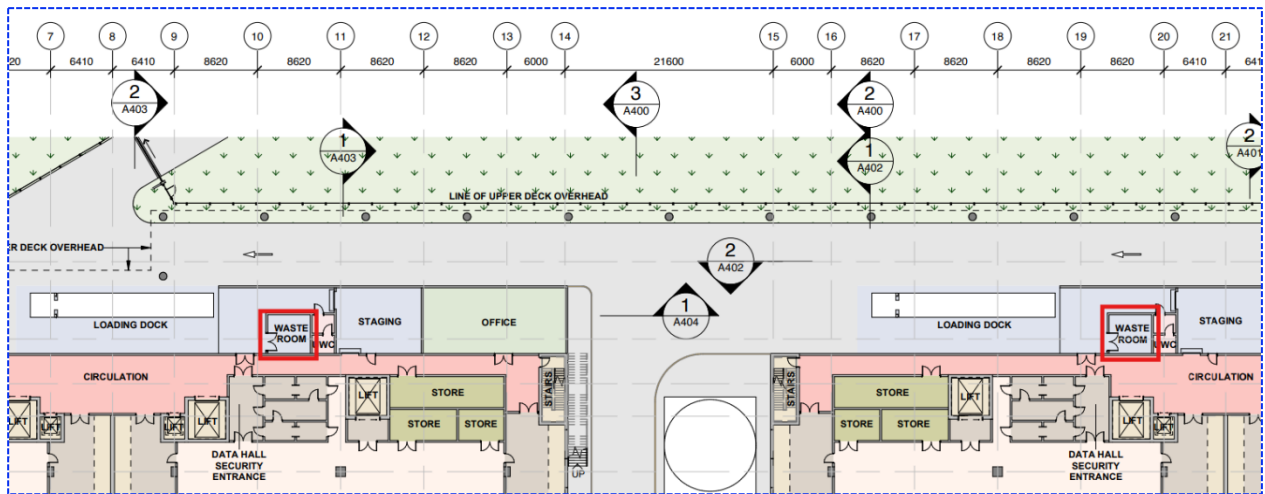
Waste storage area locations on lower ground floor – SDA-DR-A200 – Genton
